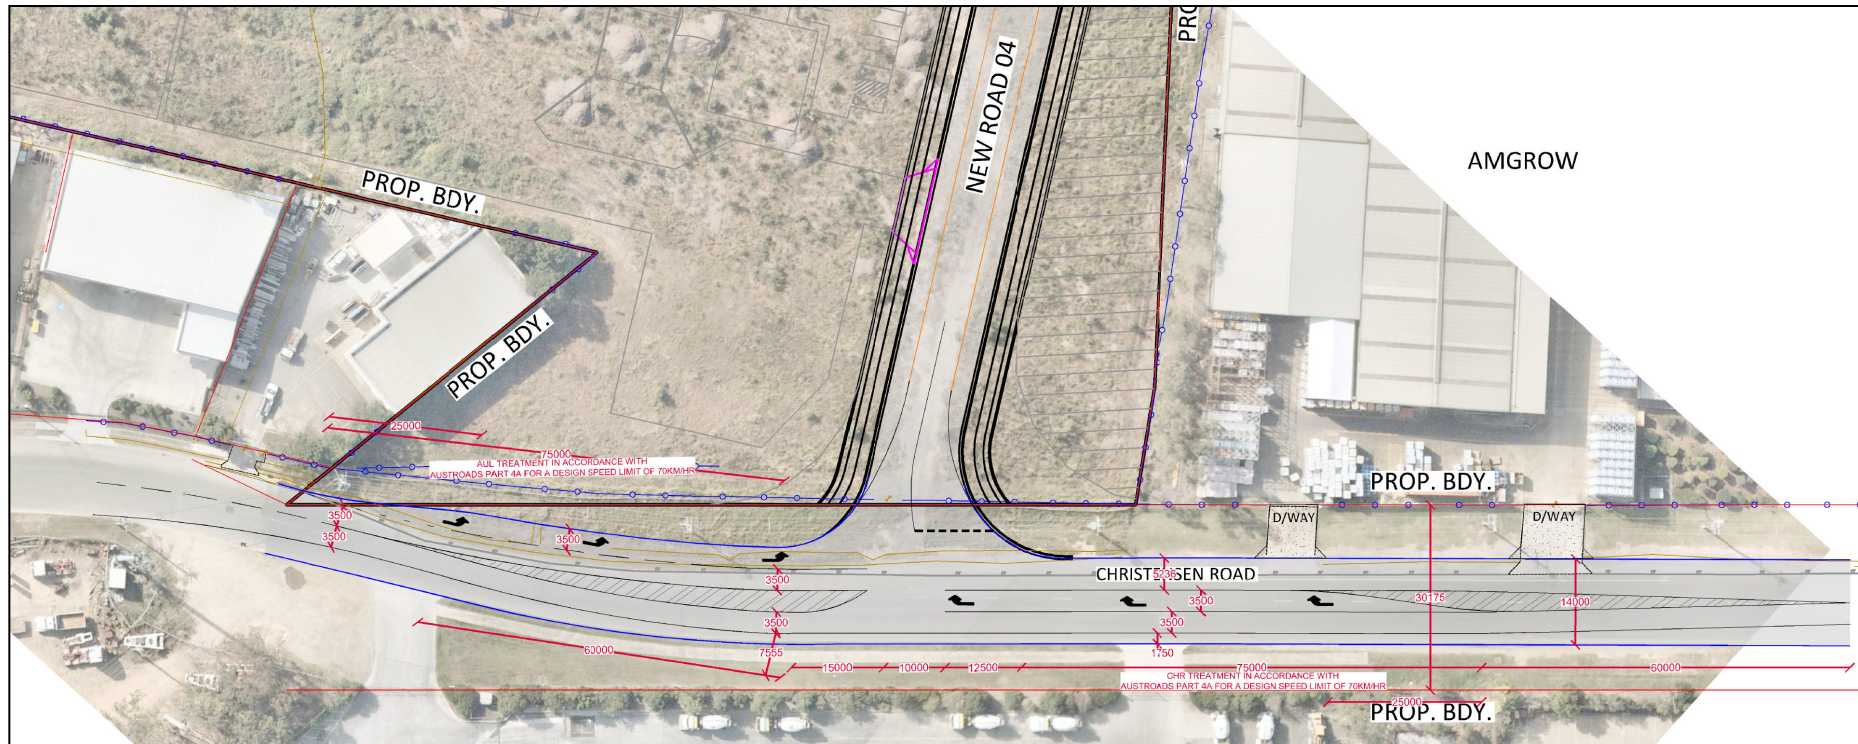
CONCEPT DESIGN OF THE PROPOSED SITE ACCESS / CHRISTENSEN ROAD INTERSECTION
